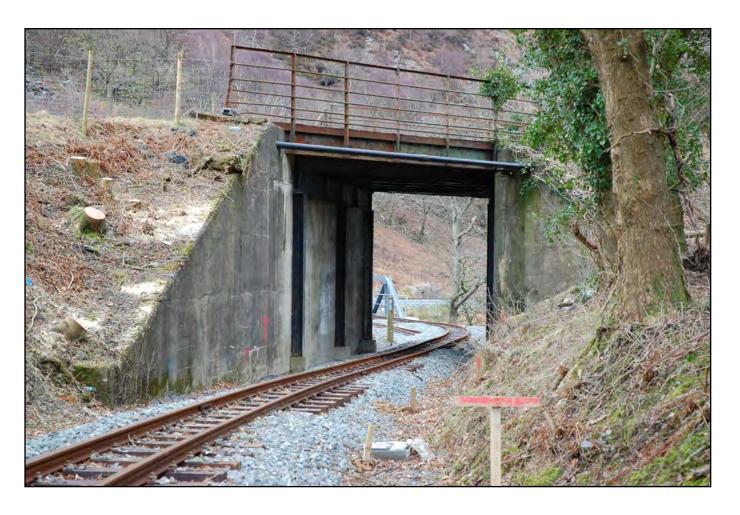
close-up of north-facing elevation prior to demolition, detailing steel parapet, road plate, conctrete abutment and steel girder shell
